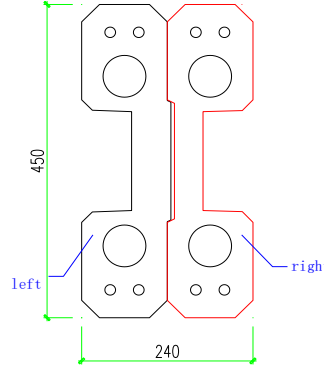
Sectional drawing of the precast pillar of layered assembled noise barrier
